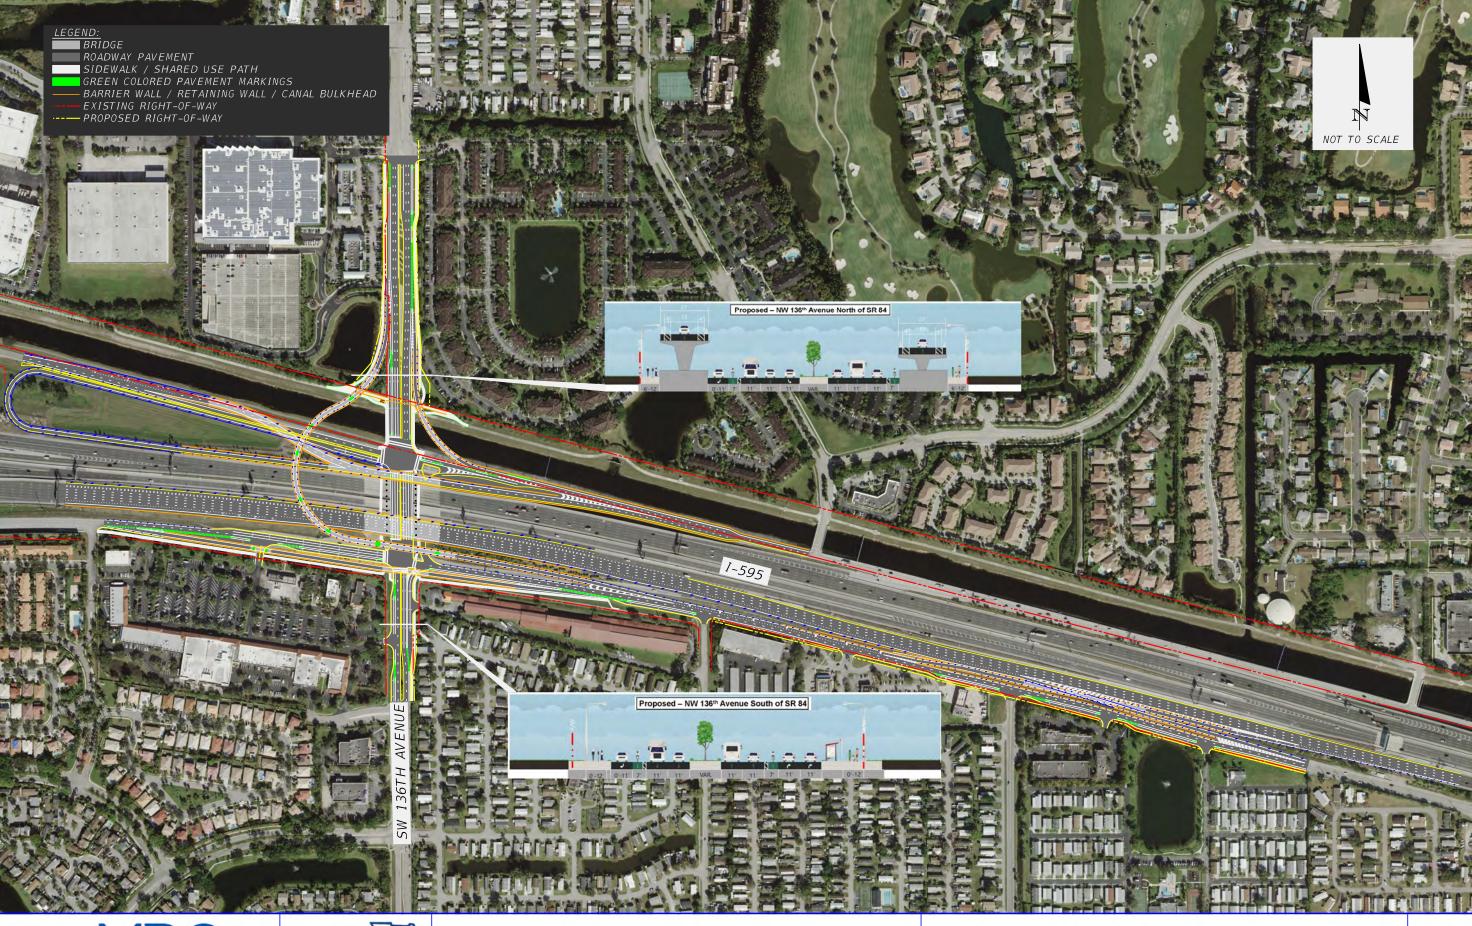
shows a conceptual plan of the project improvements as well as typical sections.
